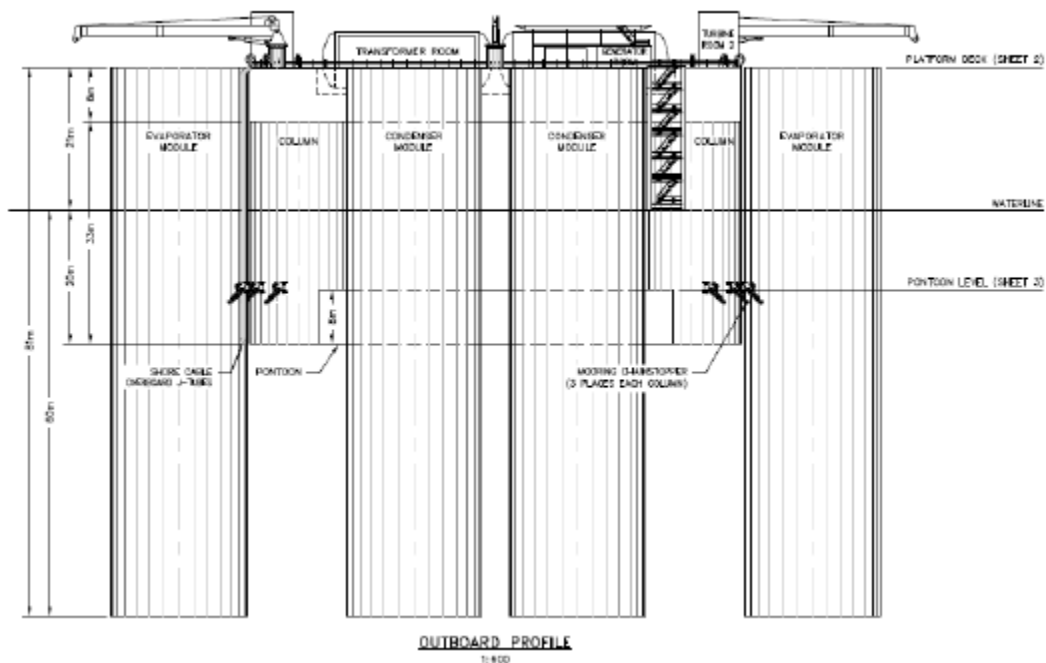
100MW OTEC Platform, Outboard Profile
